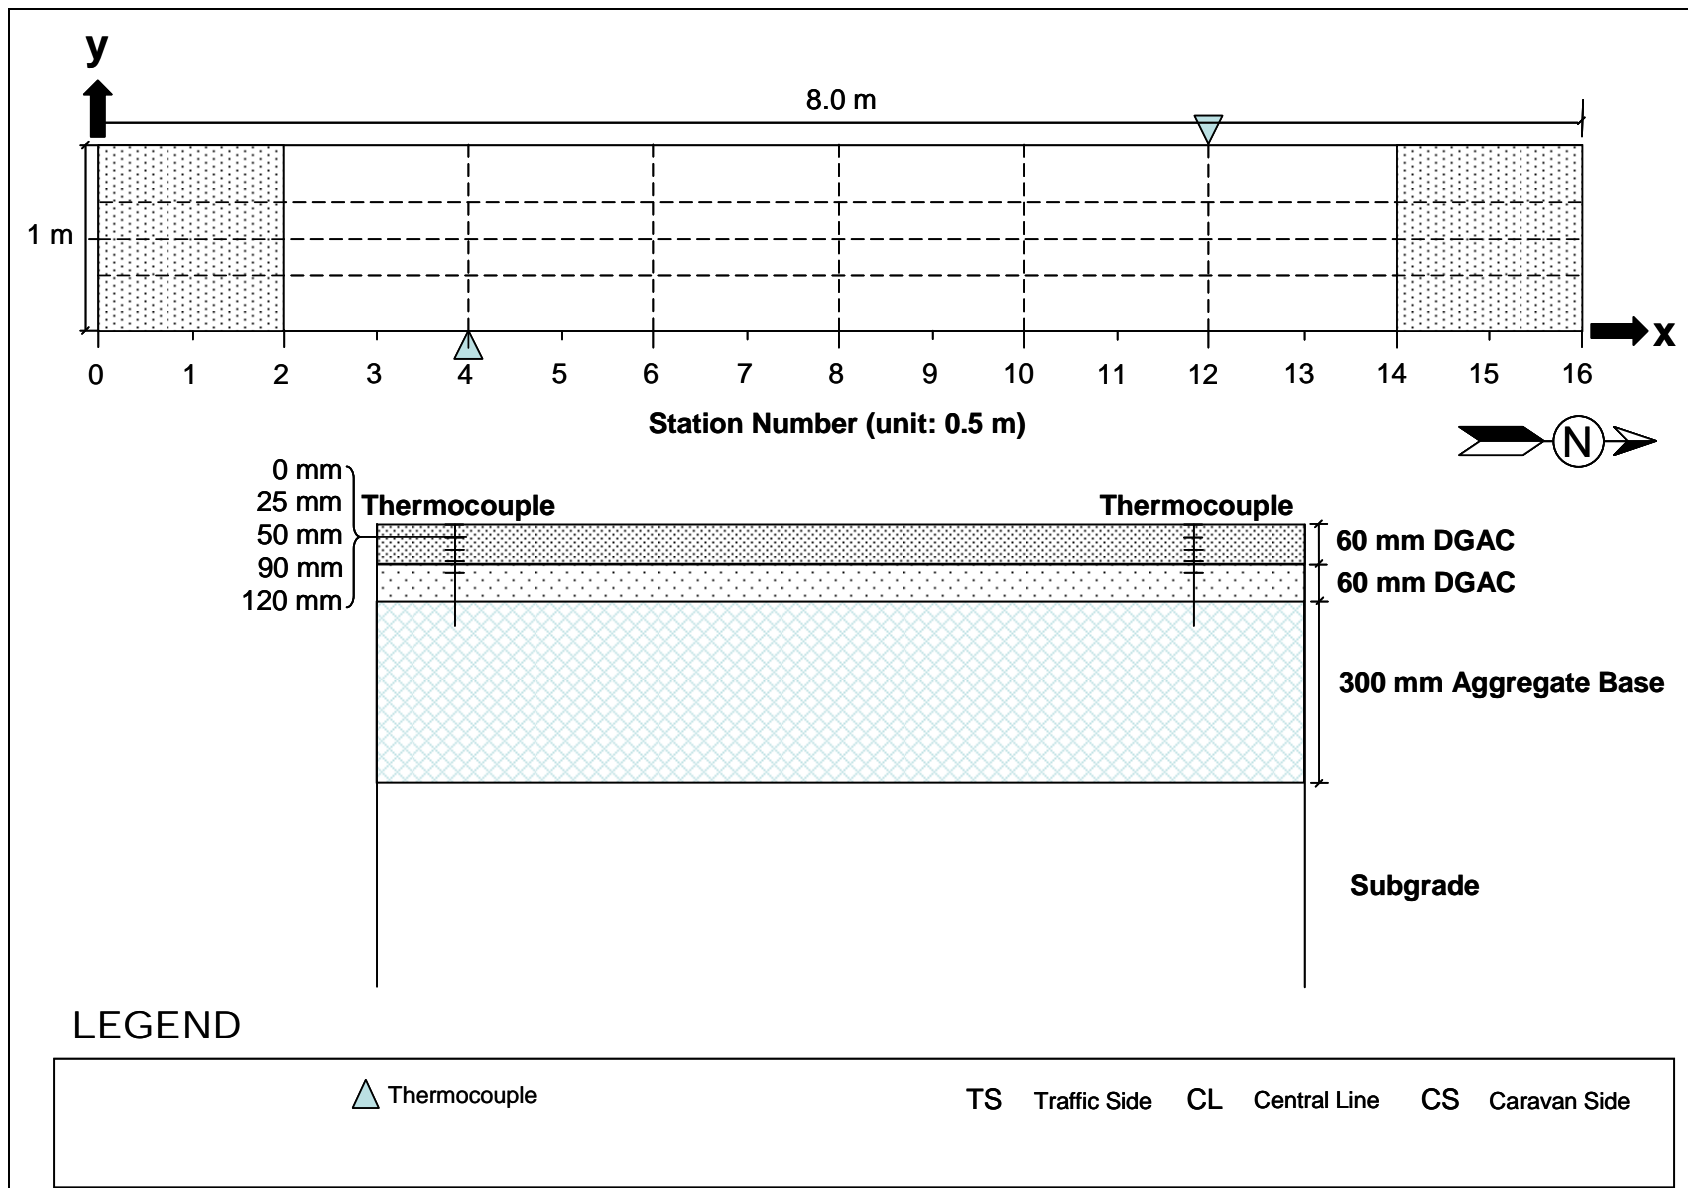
Phase 1 test section layout and location of thermocouples.
